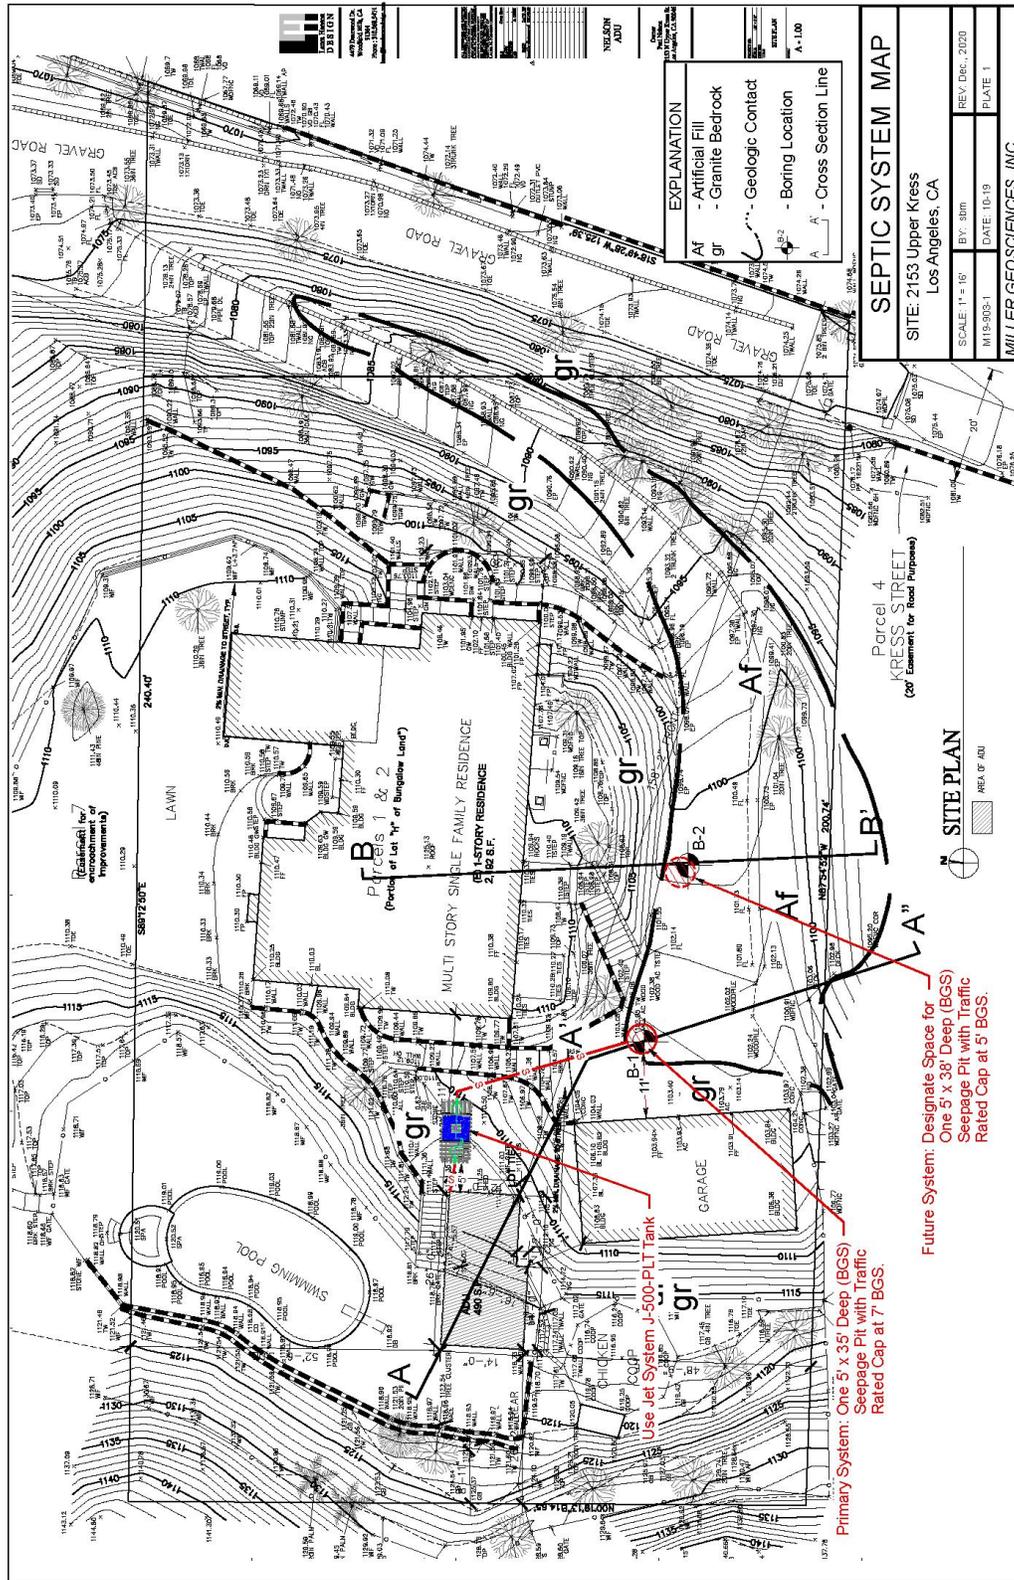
Site plan showing location of proposed ADU and advanced OWTS.
